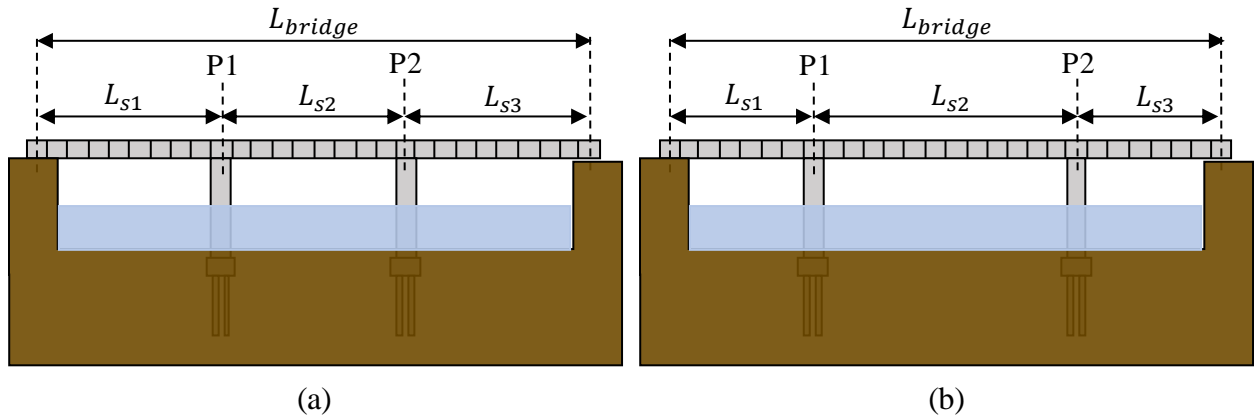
Elevation of Bridge #2 with (a) equal spans and (b) balanced cantilever configuration
